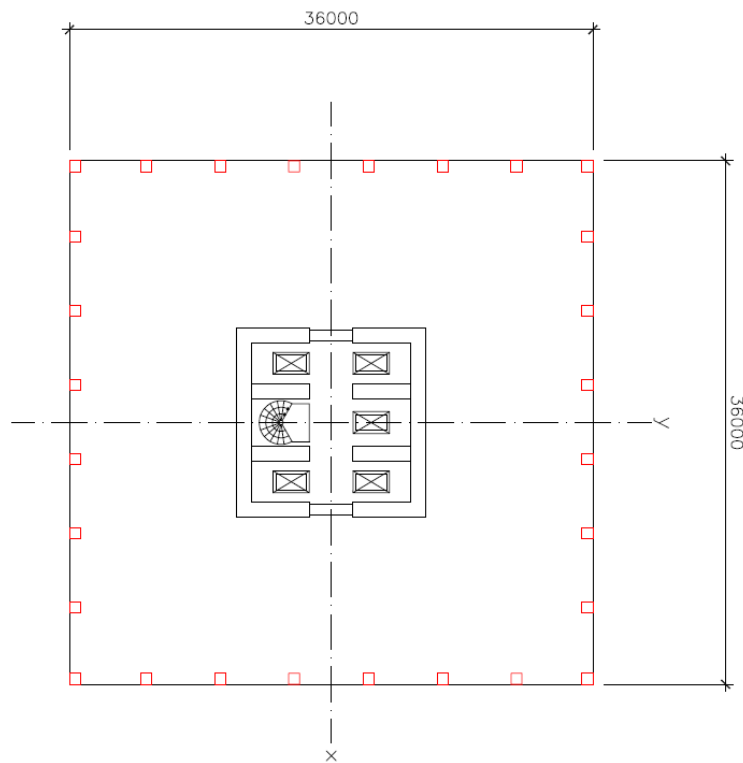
Cross-section of the assumed tall building with a façade length of 36 m.
